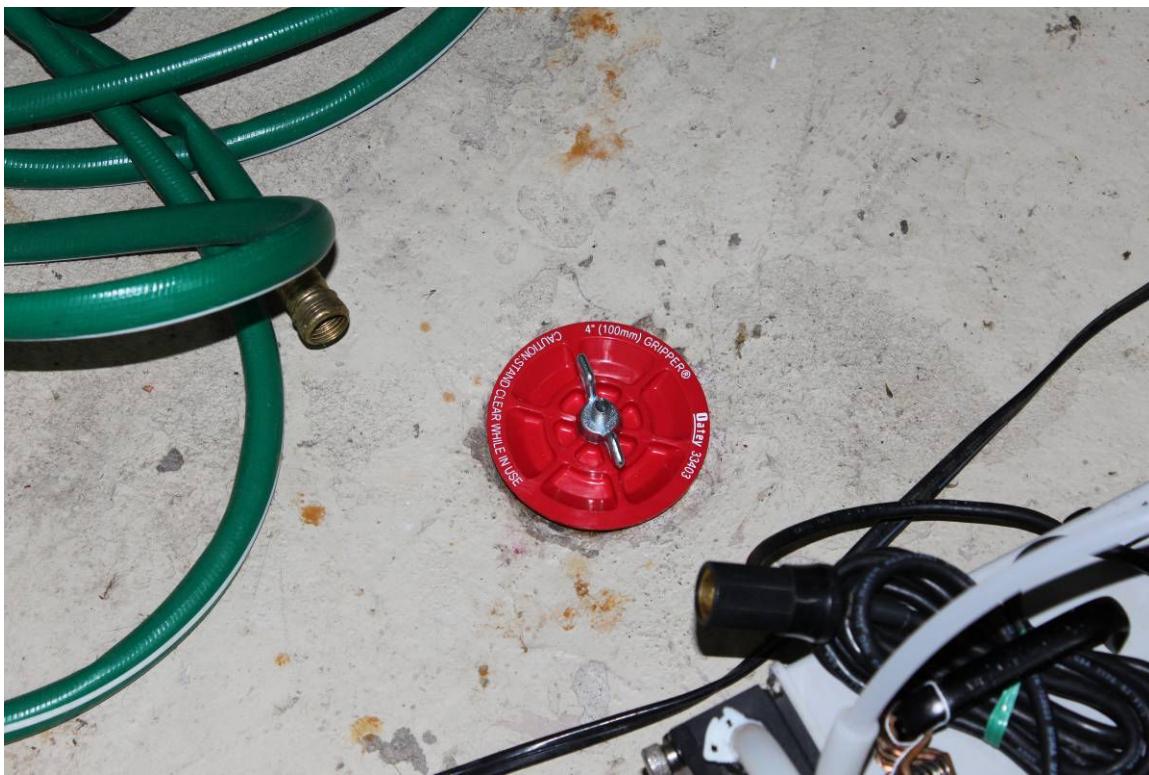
Photo of temporarily plugged floor drain in eastern corner of basement at 10 Hillside Road.
